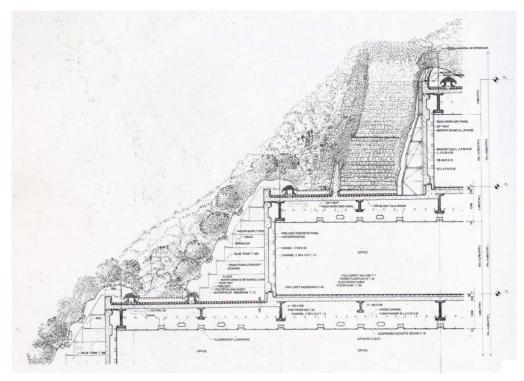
The usage of the foam blocks in earth sheltering, Fukuoka building, Japan<sup>110</sup>
